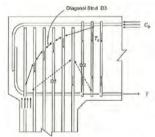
External Vertical Joint Reinforcement for Joint Force Transfer
